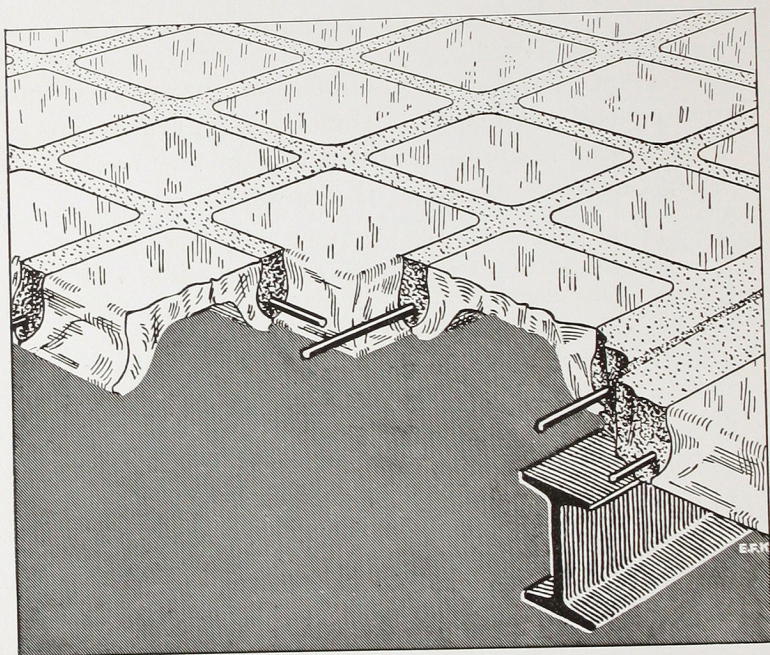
Kepler Floor, Roof and Vault Light Constructions are composed of translucent glass units, supported by reinforced concrete. They have a large glass area above, and an all-glass undersurface, which admits and distributes the maximum of light. The concrete frame-work, reinforced with rods, gives great supporting strength without cutting off the light.
